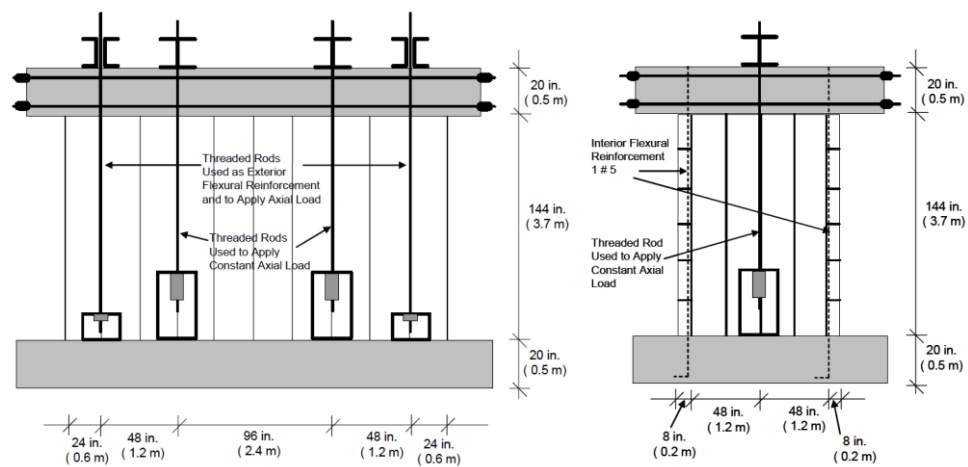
Test Setup for Specimen 2 (left); for Specimens 15a, 15b and 16 (right) (Tanner, 2003)
